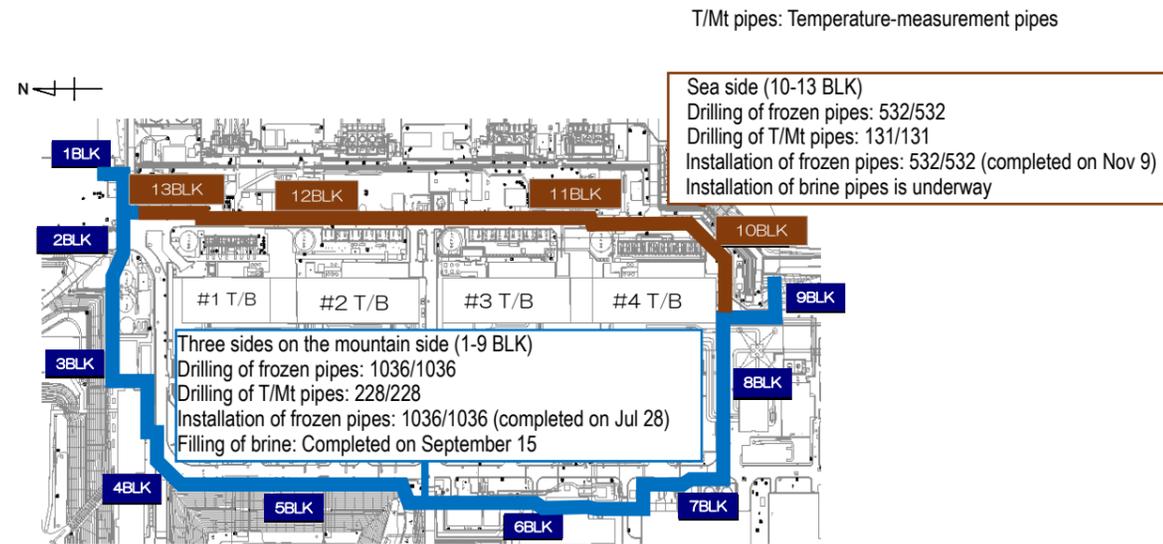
Drilling status for frozen-soil impermeable walls and installation of frozen pipes
